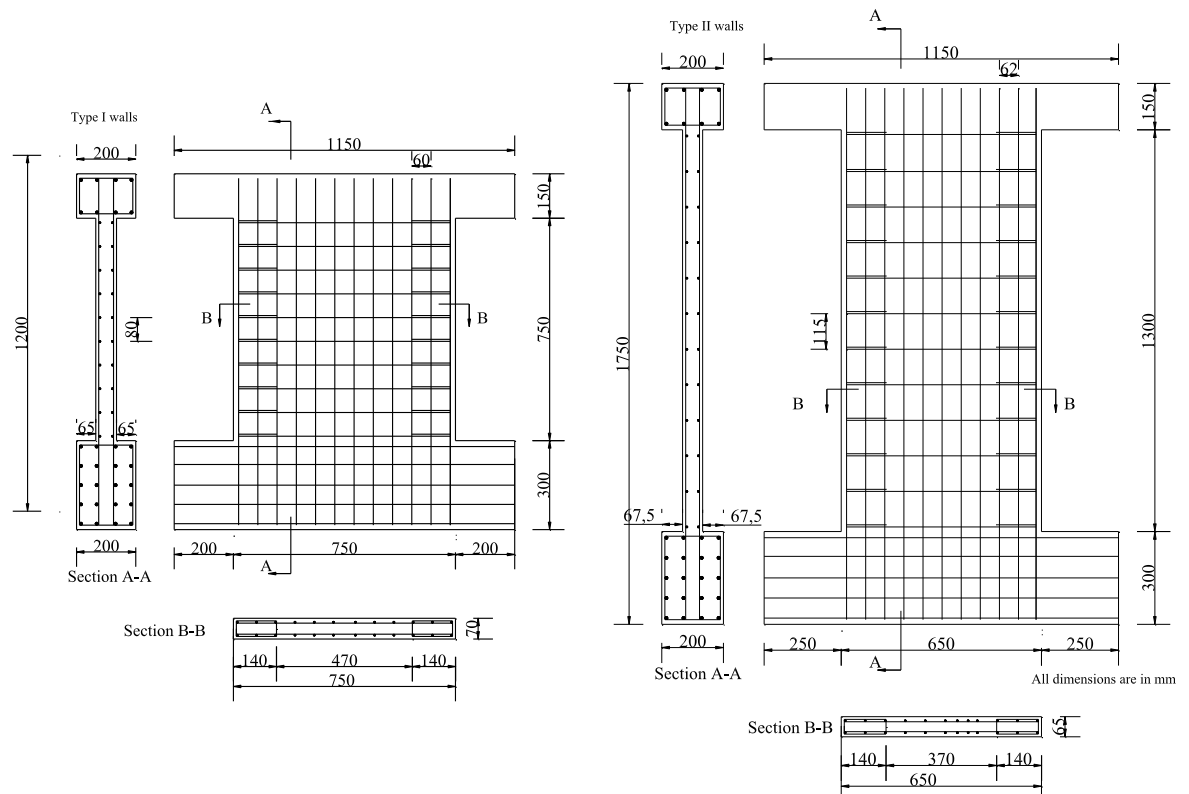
Geometry and reinforcement details of walls tested by Lefas (1988)
